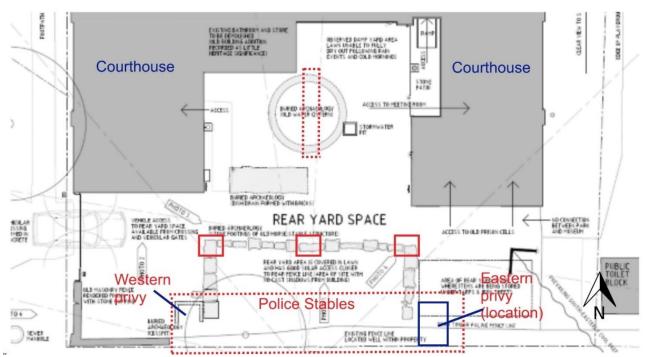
Site plan showing proposed areas of archaeological excavation in red.
